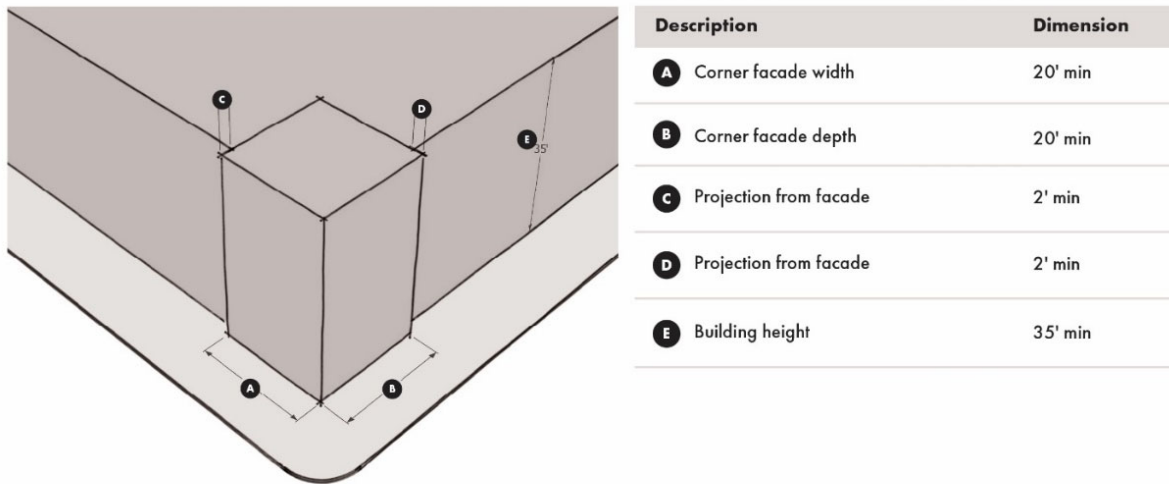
BB: Corner lower that the roof of the rest of the building.
